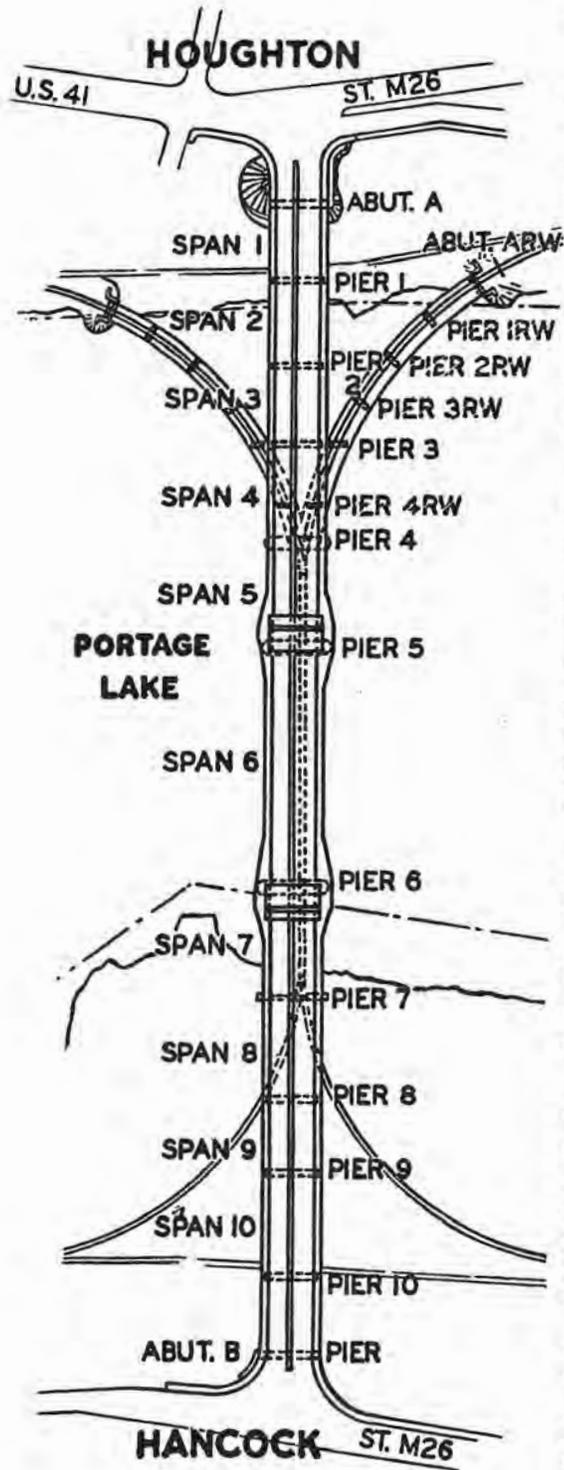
General foundation plan of new structure, showing supporting piers and caissons for combined, highway and railroad portions.
